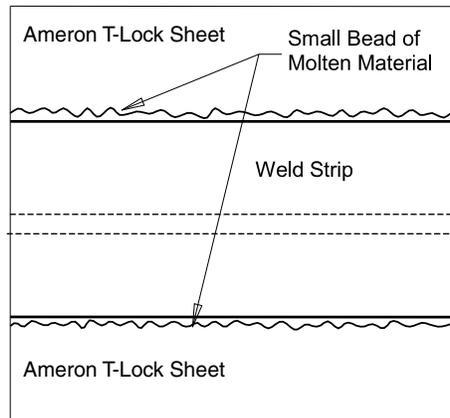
A small continuous bead of fused material should be visible along each edge of the weld strip.
